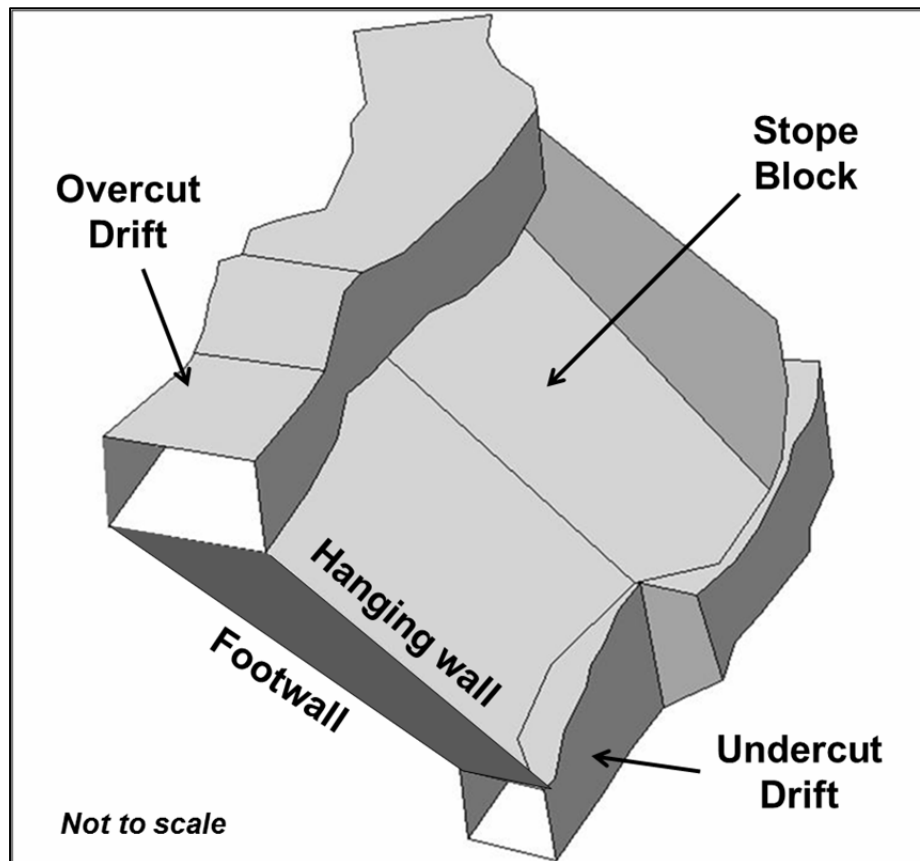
Isometric view illustrating the stope overcut drift, undercut drift, hanging wall, and footwall (After Forster et al., 2007).
